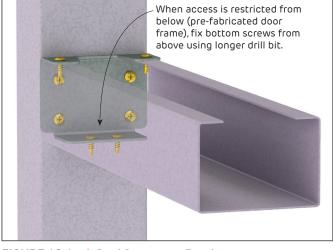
Jamb Stud Connector BracketWith access from above only (pre-fabricated door frames)
